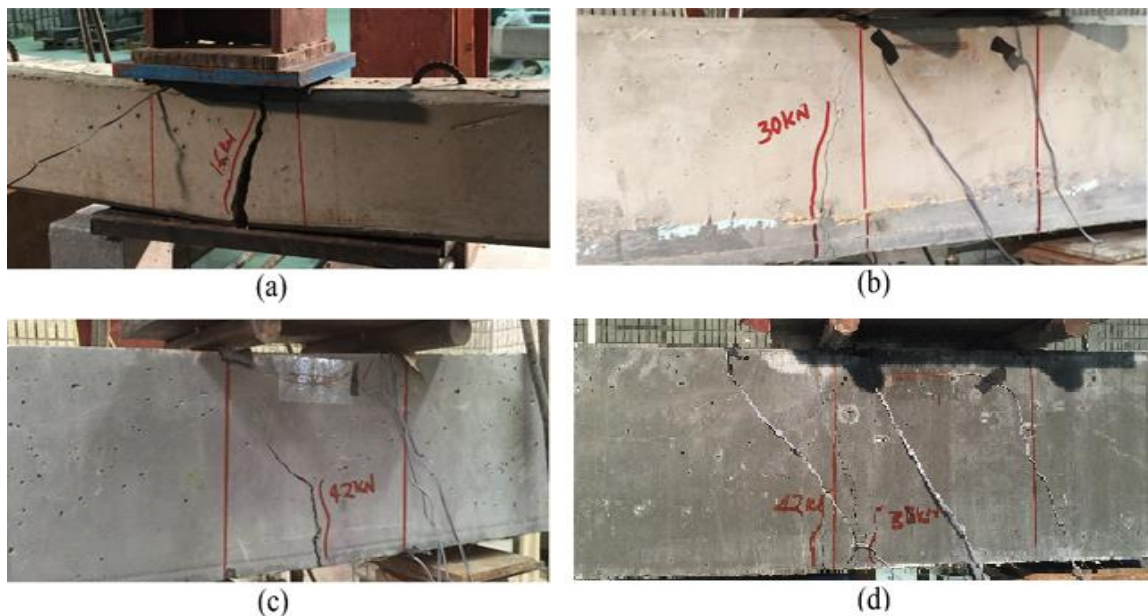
Crack patterns for plain concrete beam specimens (a) PC – Control (b) PC – SB – BOT SJ (c) PC – SB – 2 SJ (d) PC – SB – 3 SJ
